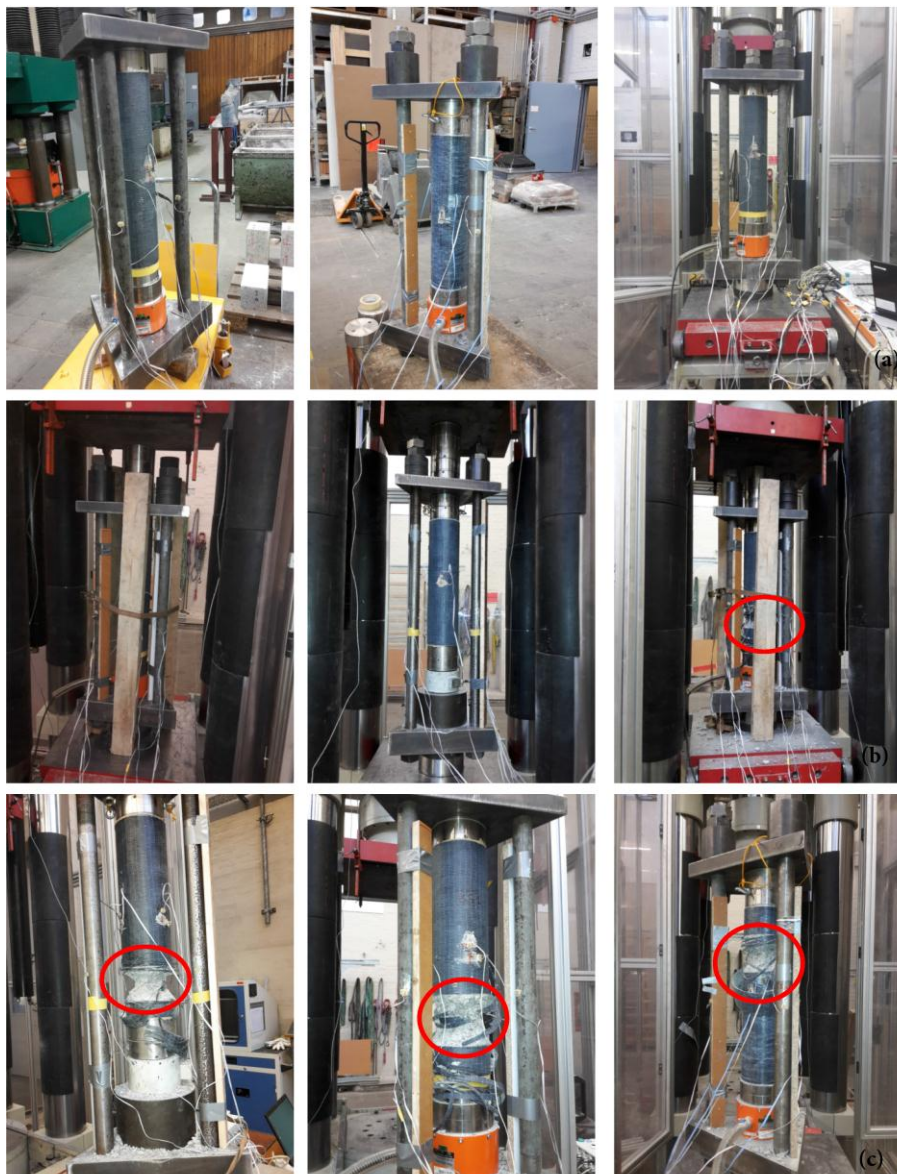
Specimen under preload (a); failure test on preloaded specimens (b); specimens at the end of failure tests (c).
